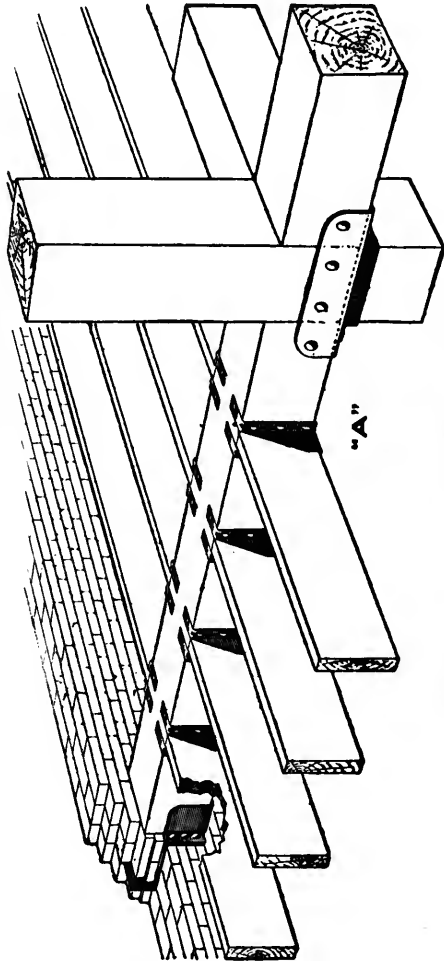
Van Dorn Joist Hangers and Post Cap.
